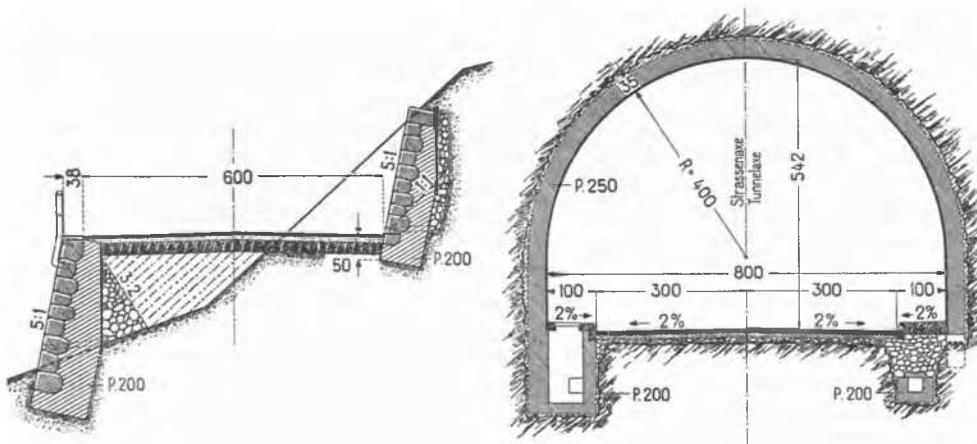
Sustenpass Road. Left: Standard Cross Section. Right: Tunnel Cross Section (in cm)
